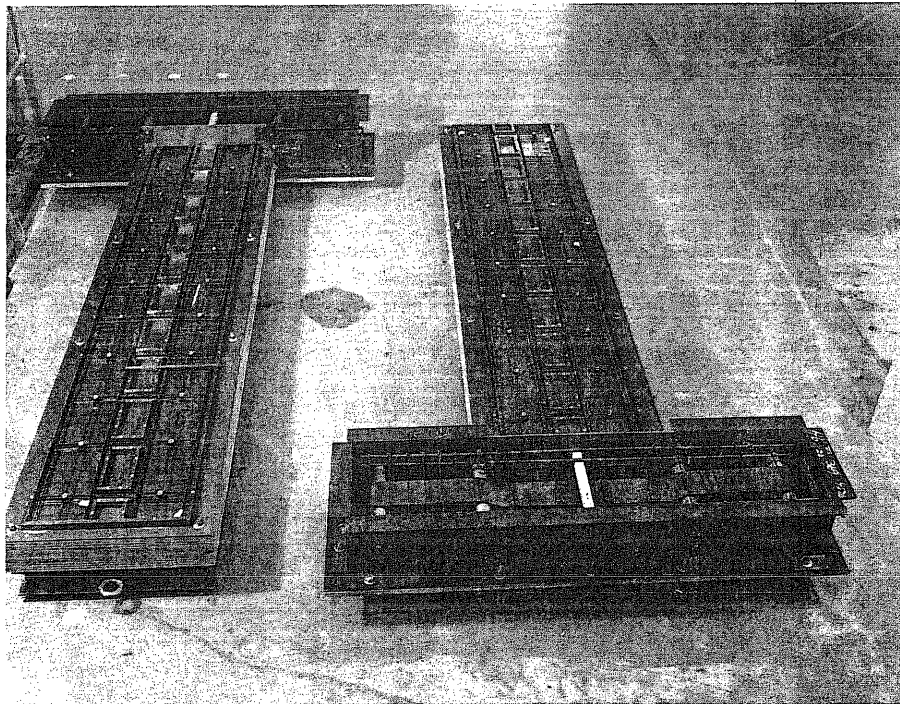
A Typical Reinforcement Cage in the Casting Form
